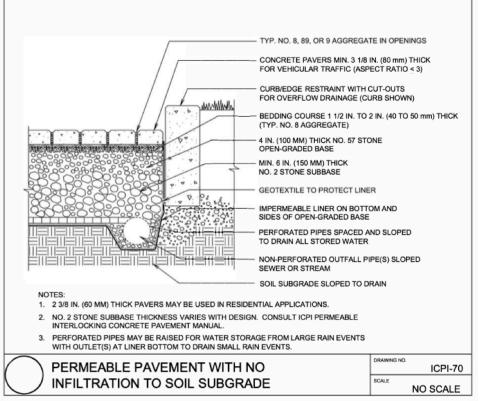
PERMEABLE PAVEMENT WITH NO INFILTRATION TO SOIL SUBGRADE
